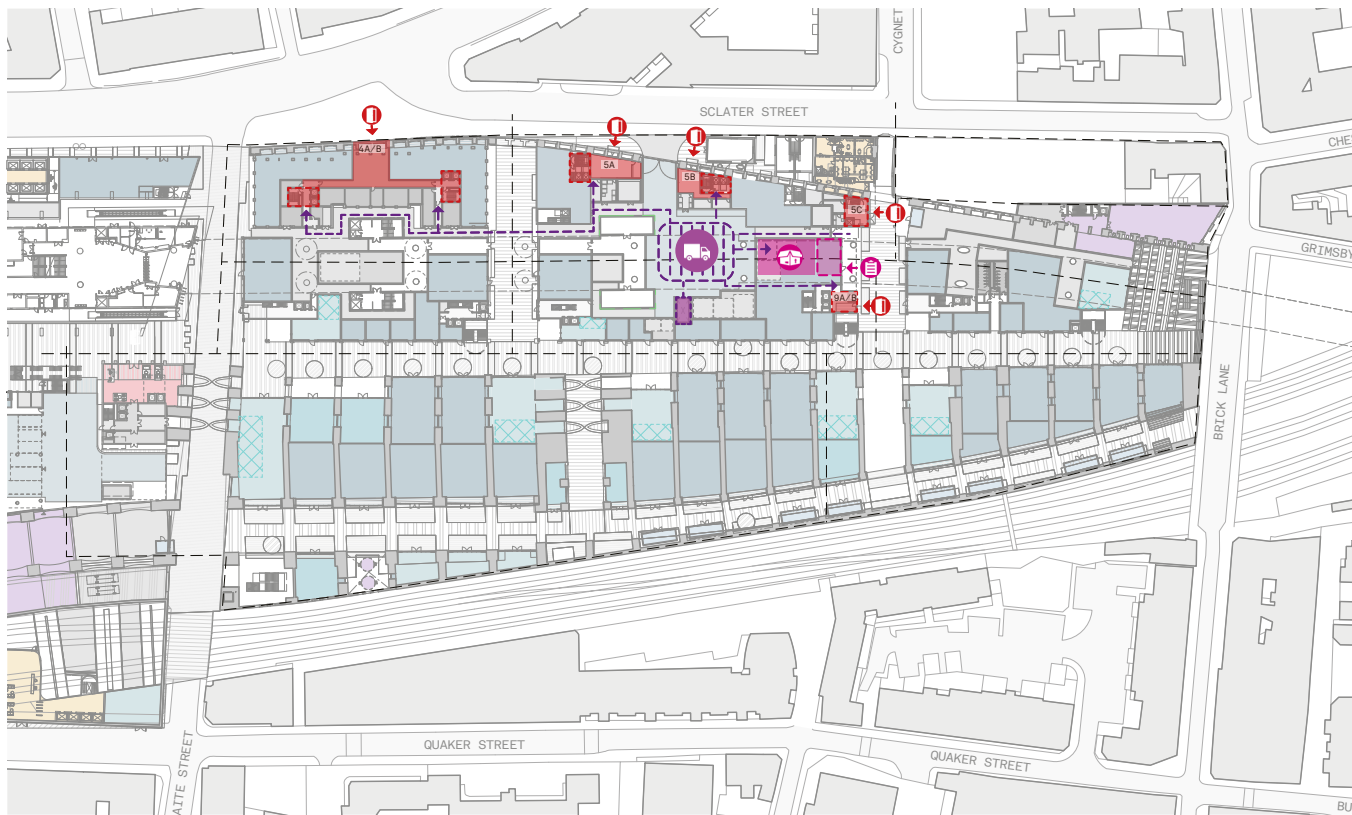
September 2018 Masterplan - Ground Floor (servicing and access)
